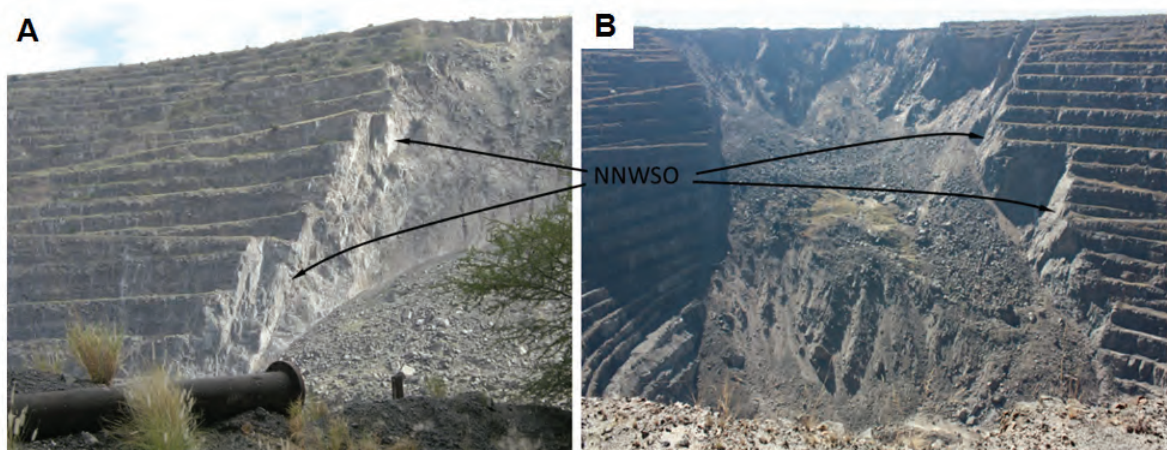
Exposure of north-north-west structural orientation in the north wall failure scarp.
